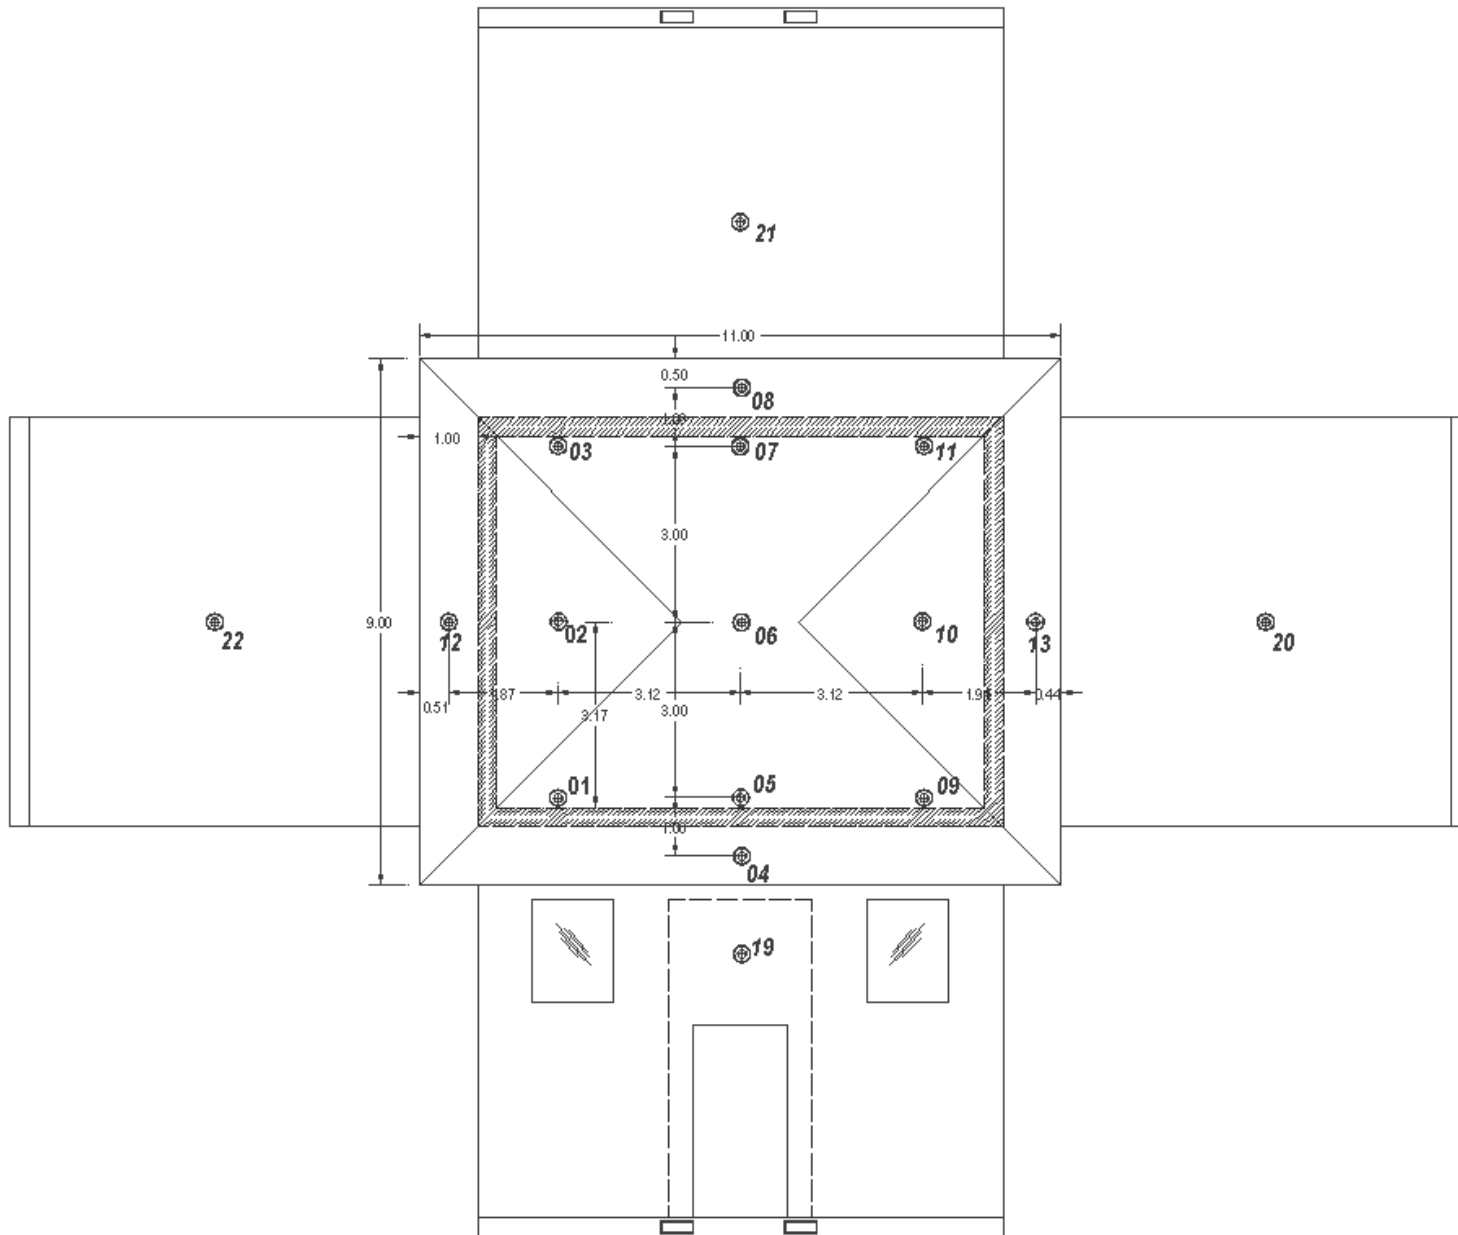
Exploded plan view of hip roof internal pressure tap layout
